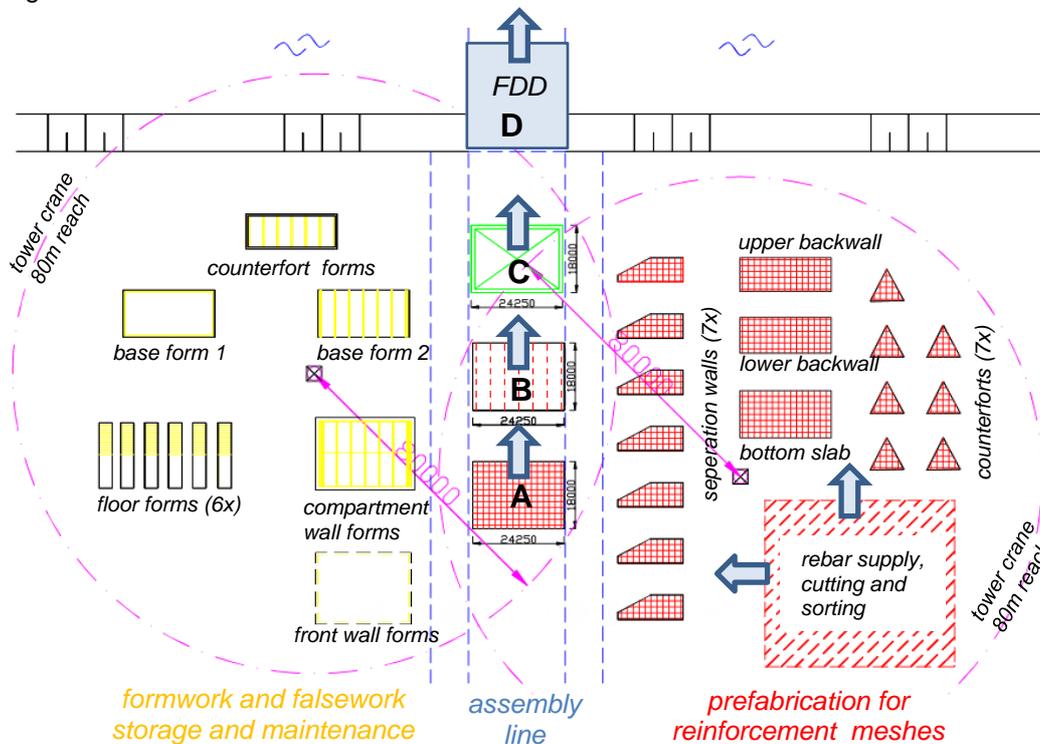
Proposed construction site layout for the overturning caisson (12.60m)
